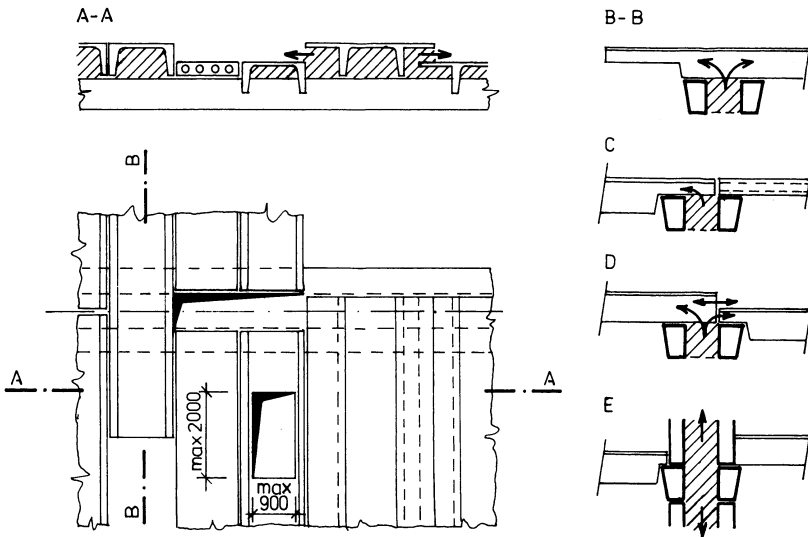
Arrangement of beams and slabs in floor construction—possibilities of wiring and piping in all directions
